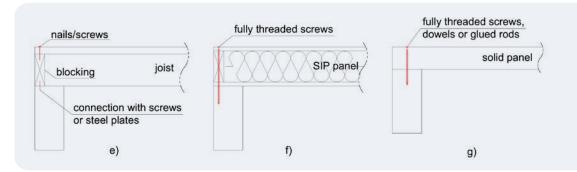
Suggested diaphragm to frame connections (floor joists on top of beam):
